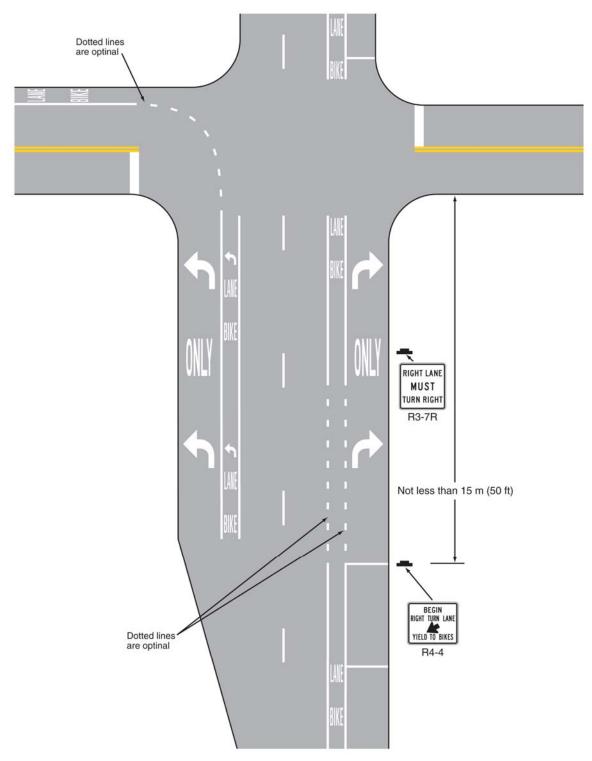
Example of Intersection Pavement Markings – Designated Bicycle Lane with Left-Turn Area, Heavy Turn Volumes, Parking, One-Way Traffic, or Divided Highway
